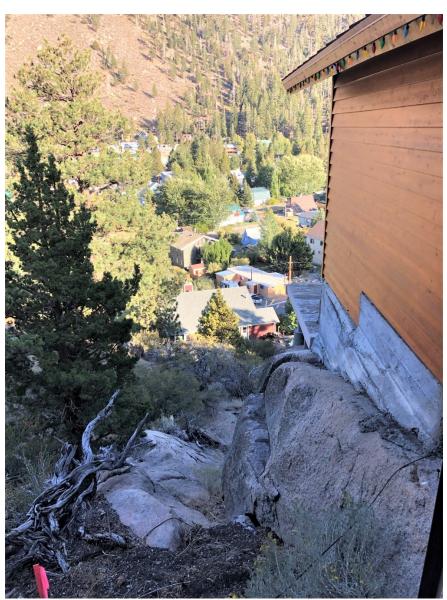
View along the north side of the house of the steep and rocky decline to the southeast
